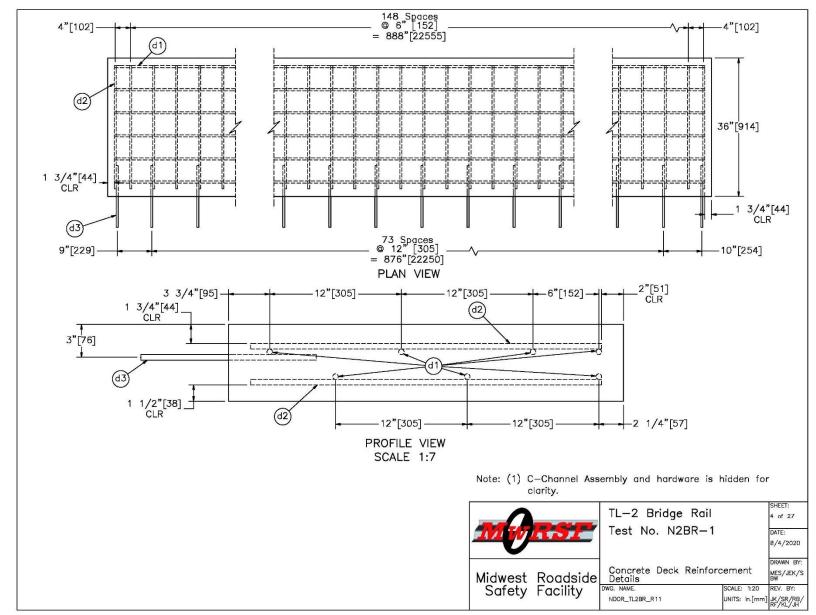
Concrete Deck Reinforcement, Test No. N2BR-1
